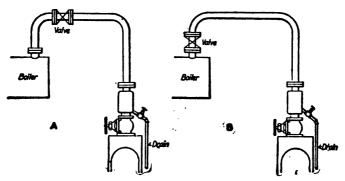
No water can collect in the layout "A", if the drip valve is open; but "B" will collect condensate.
